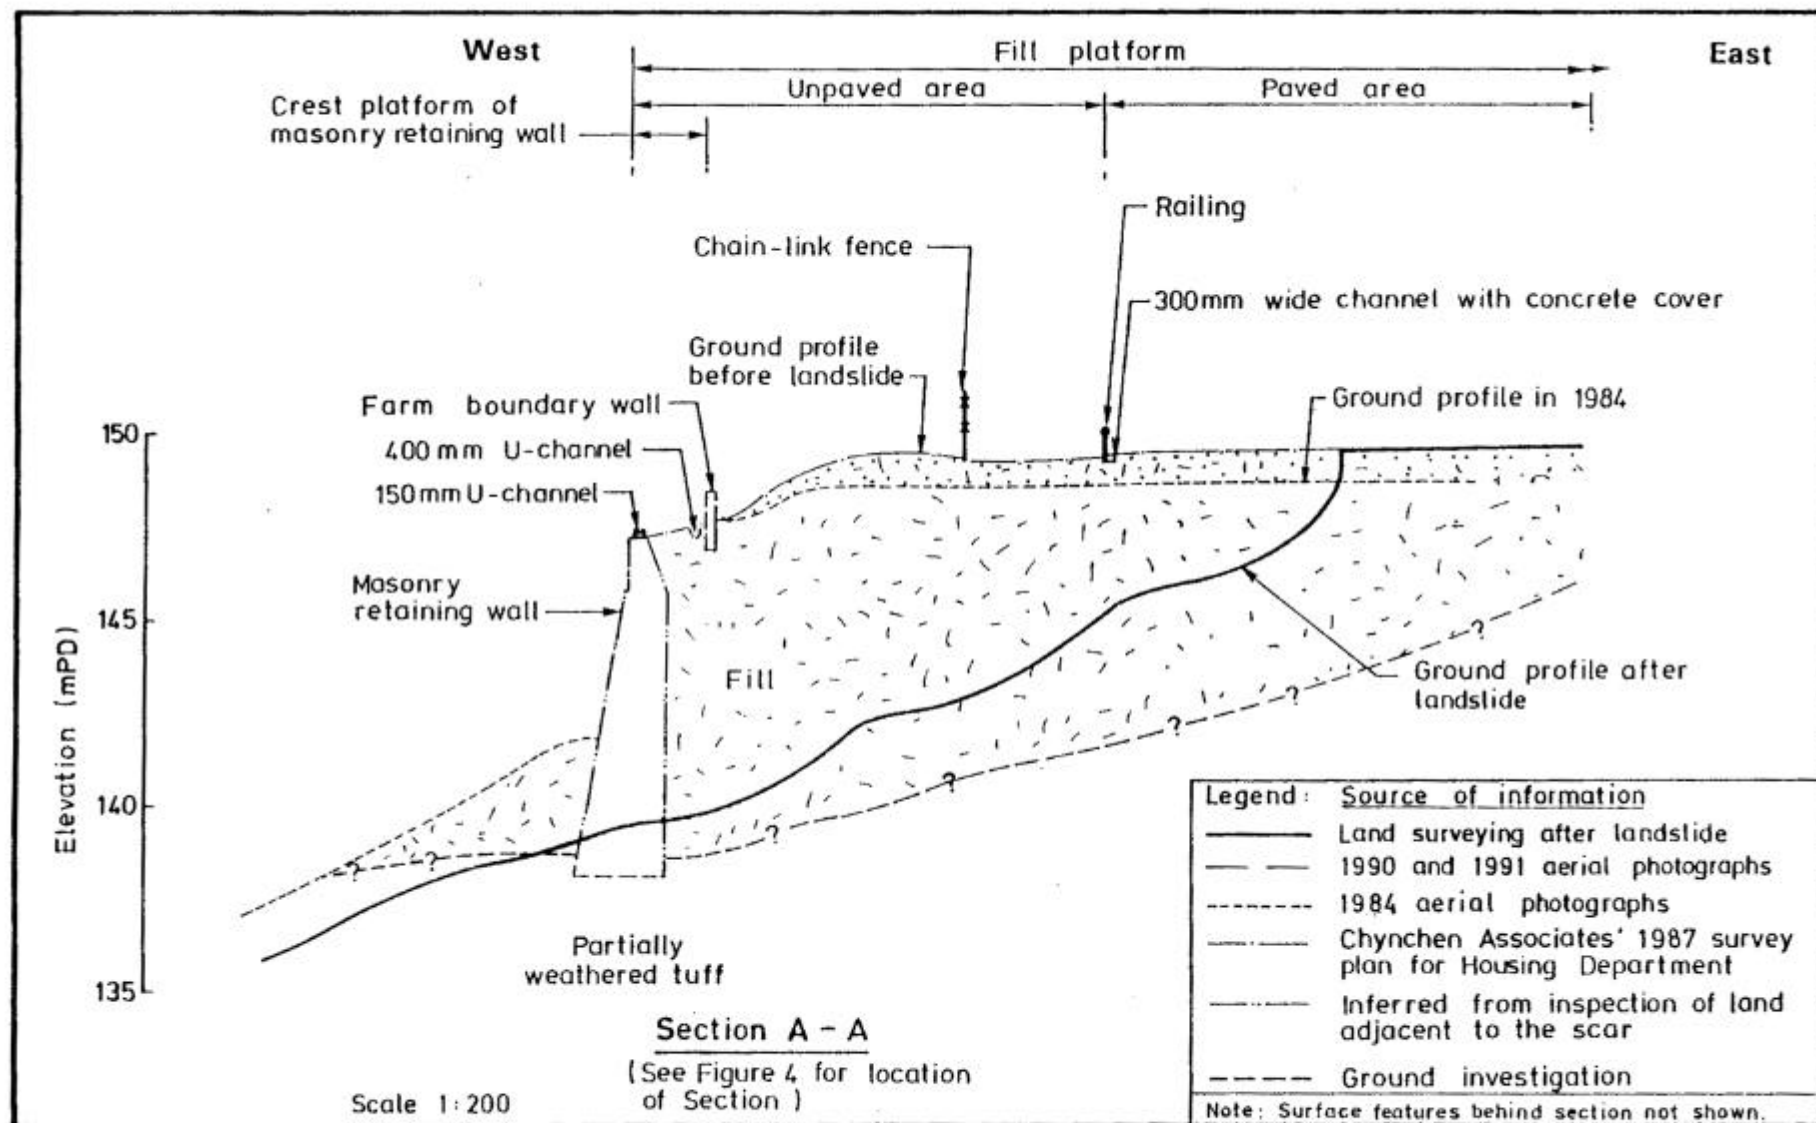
Cross-section of the Sitting-out Area at Pokfulam THA
